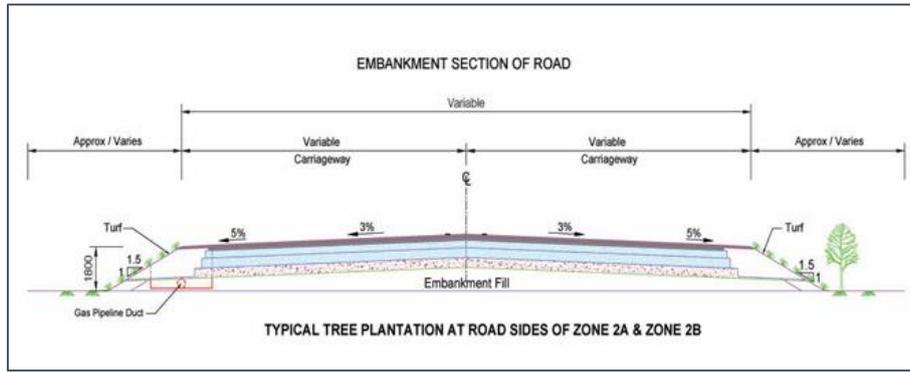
Tree plantation plan at road sides of zone 2a and zone 2b
